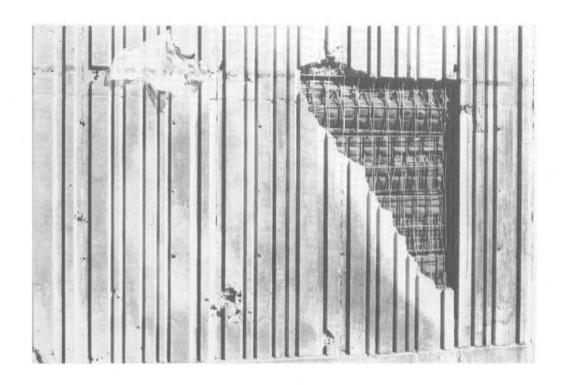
Two Panels That Needed to be Broken Out and Replaced.
